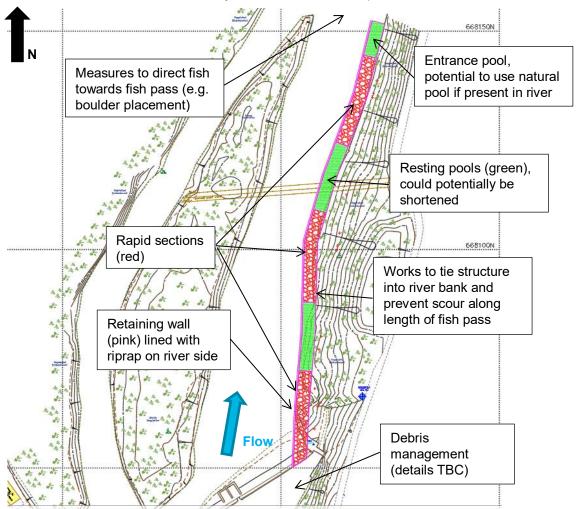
Plan of the Canalised Fish Pass initial design option
